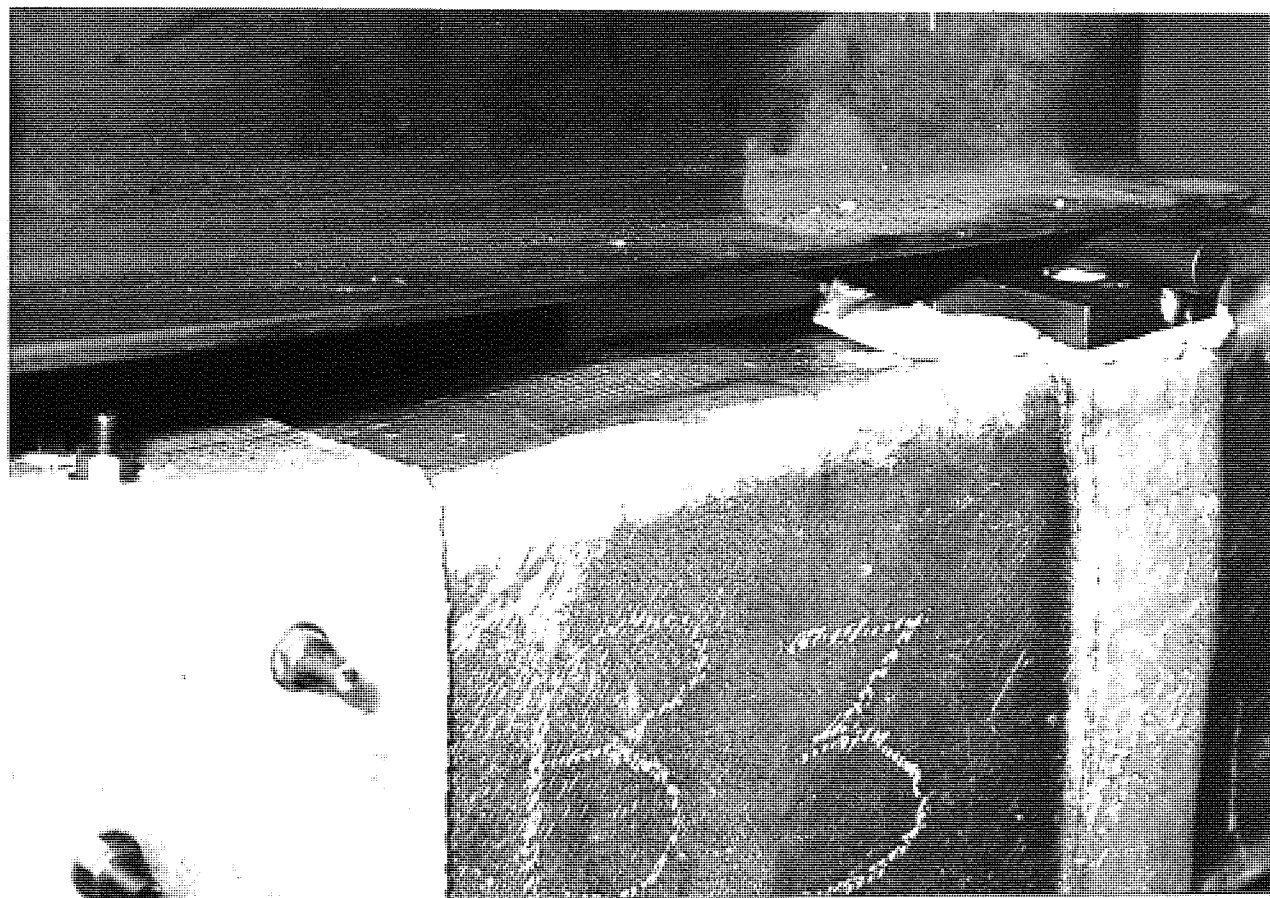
DEVELOPMENT OF LOCAL BUCKLING IN COMPRESSION FLANGE NEAR THE JOINT PRIOR TO FAILURE (BEAM TYPE C4)
